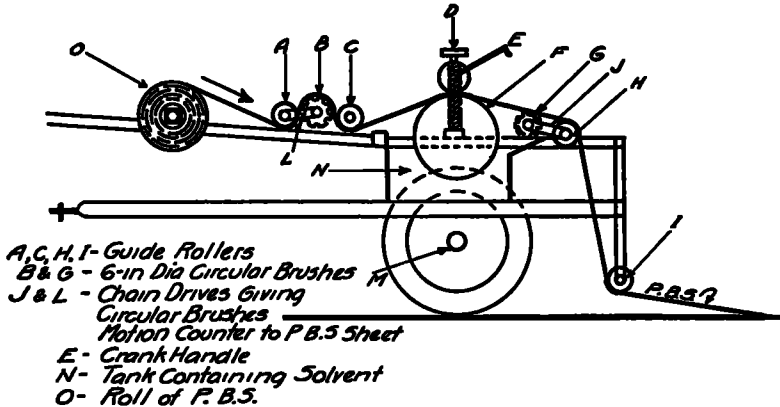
Sketch of P.B.S. Laying Machine—India Design
